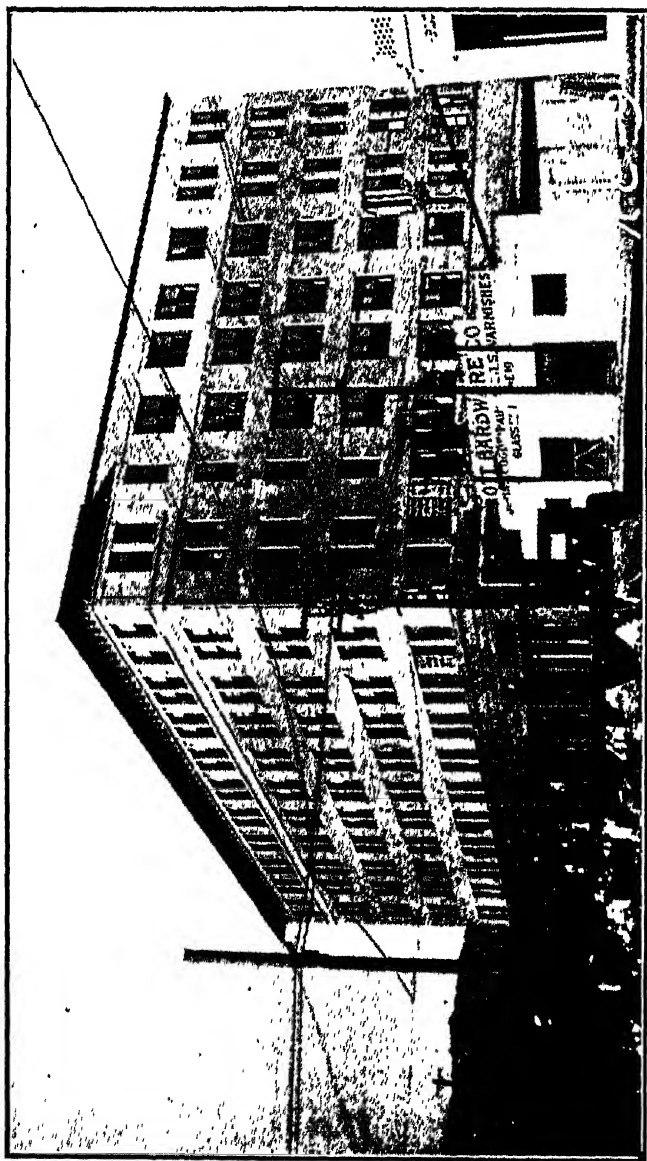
CENTRAL BUILDING, SANTA BARBARA, CALIFORNIA.
